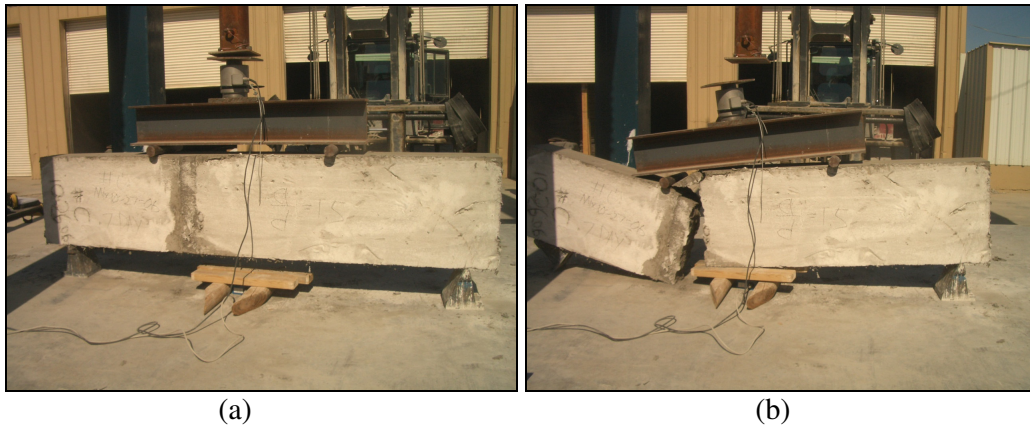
Beam for concrete cast on 10/27/06 for 7 day test;
